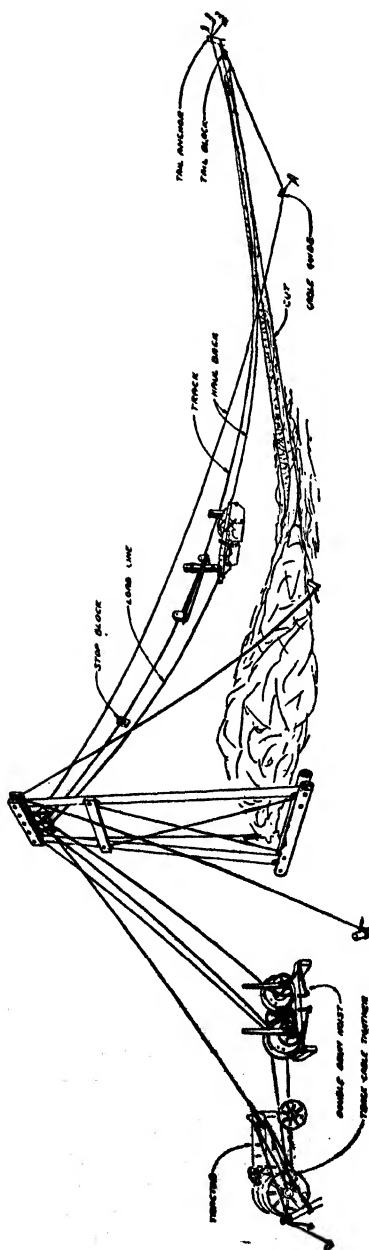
This drawing shows the set-up of marl digging equipment.
